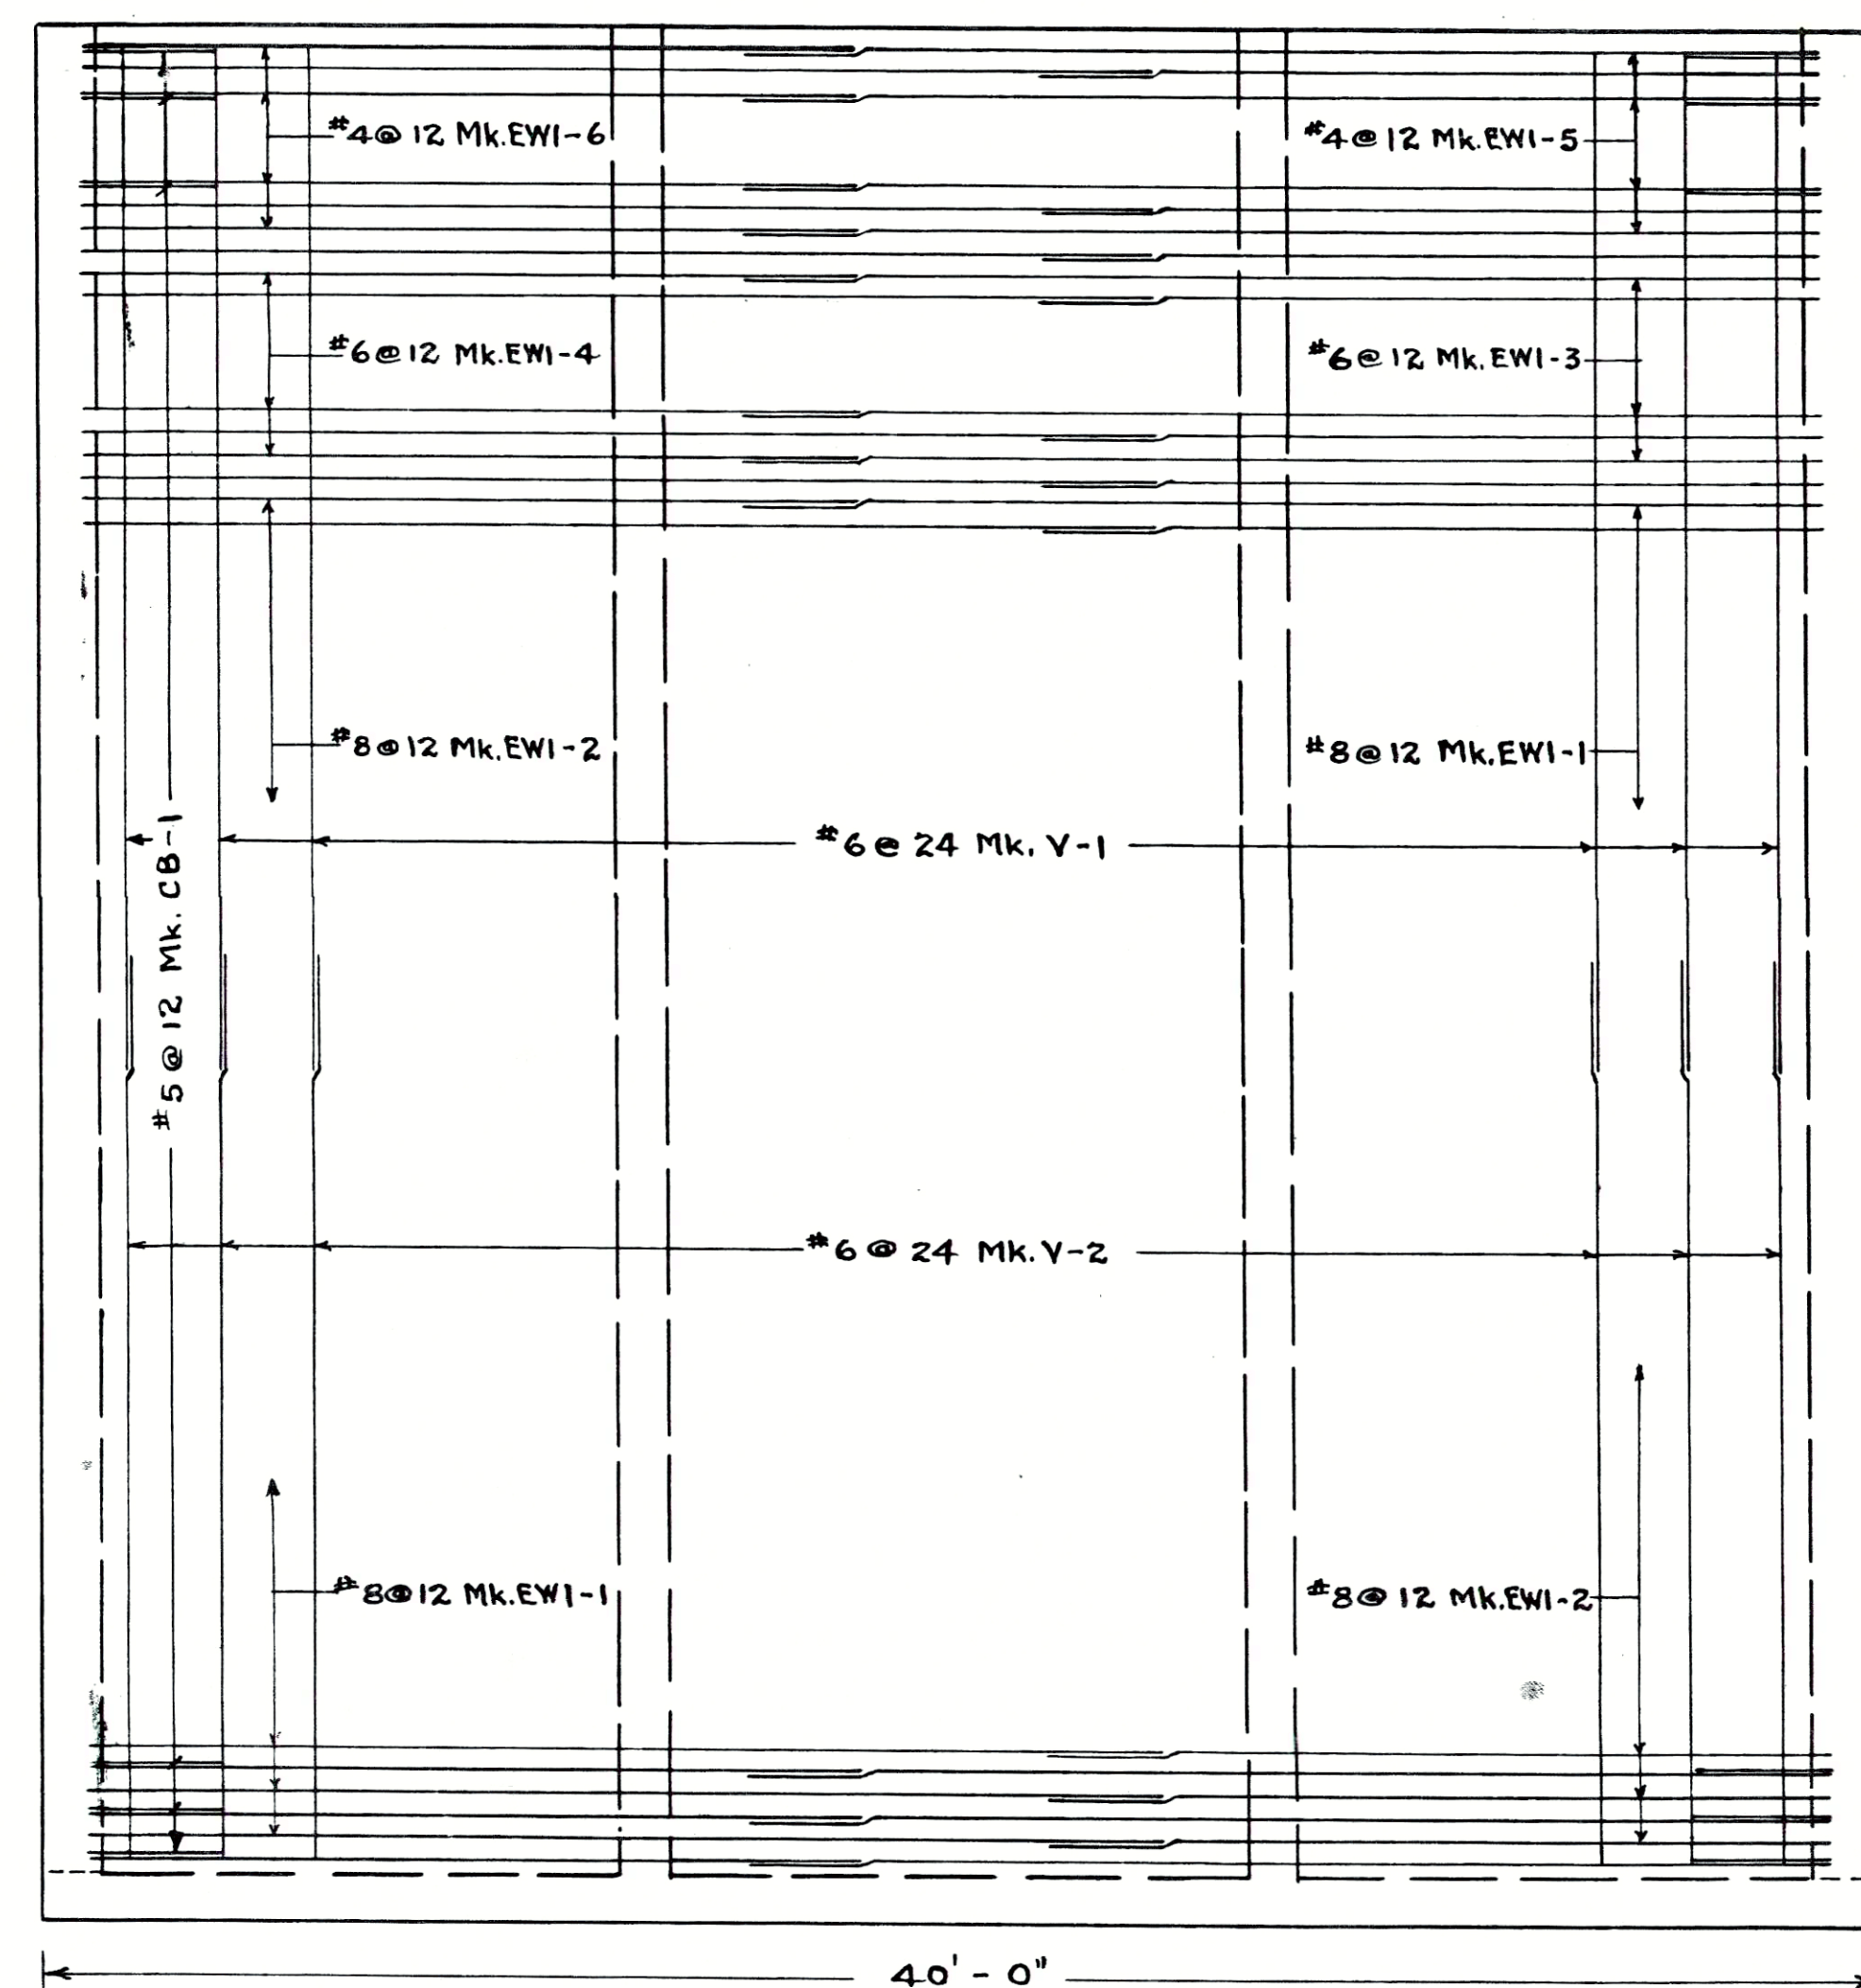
DETAIL OF OUTSIDE STEEL - END WALLS- CRIBS 2,3,4,6 & 7
